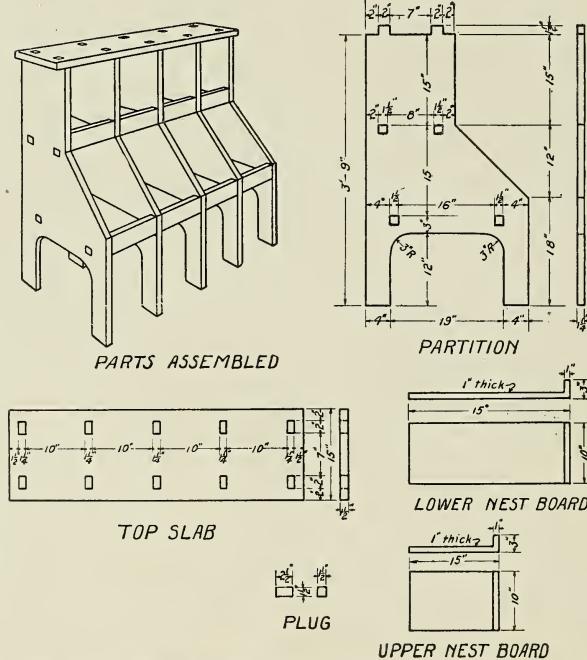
Plan for a Battery of Concrete Hens' Nests, suitable for use in Concrete Poultry House.
